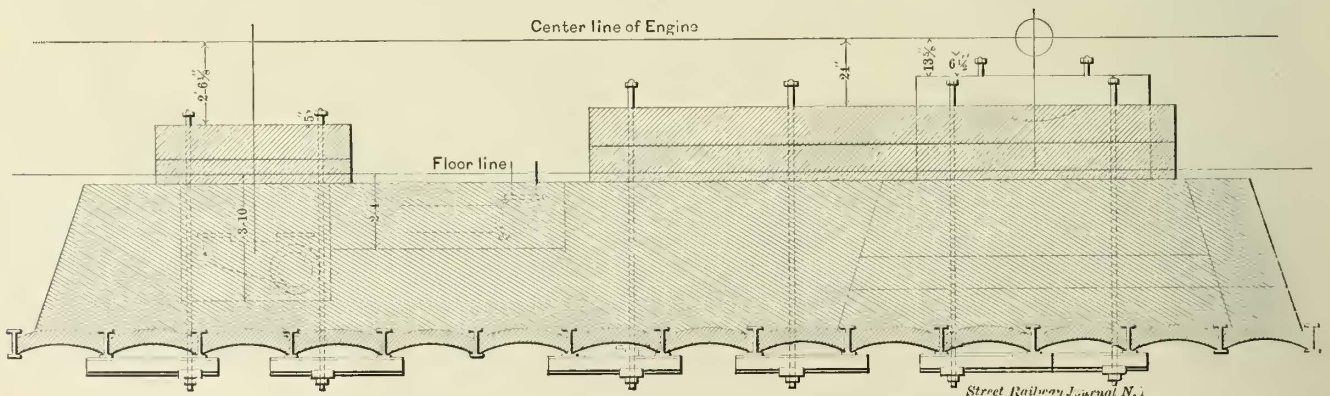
LONGITUDINAL SECTION OF ENGINE FOUNDATION—COLUMBUS RAILWAY POWER STATION.
